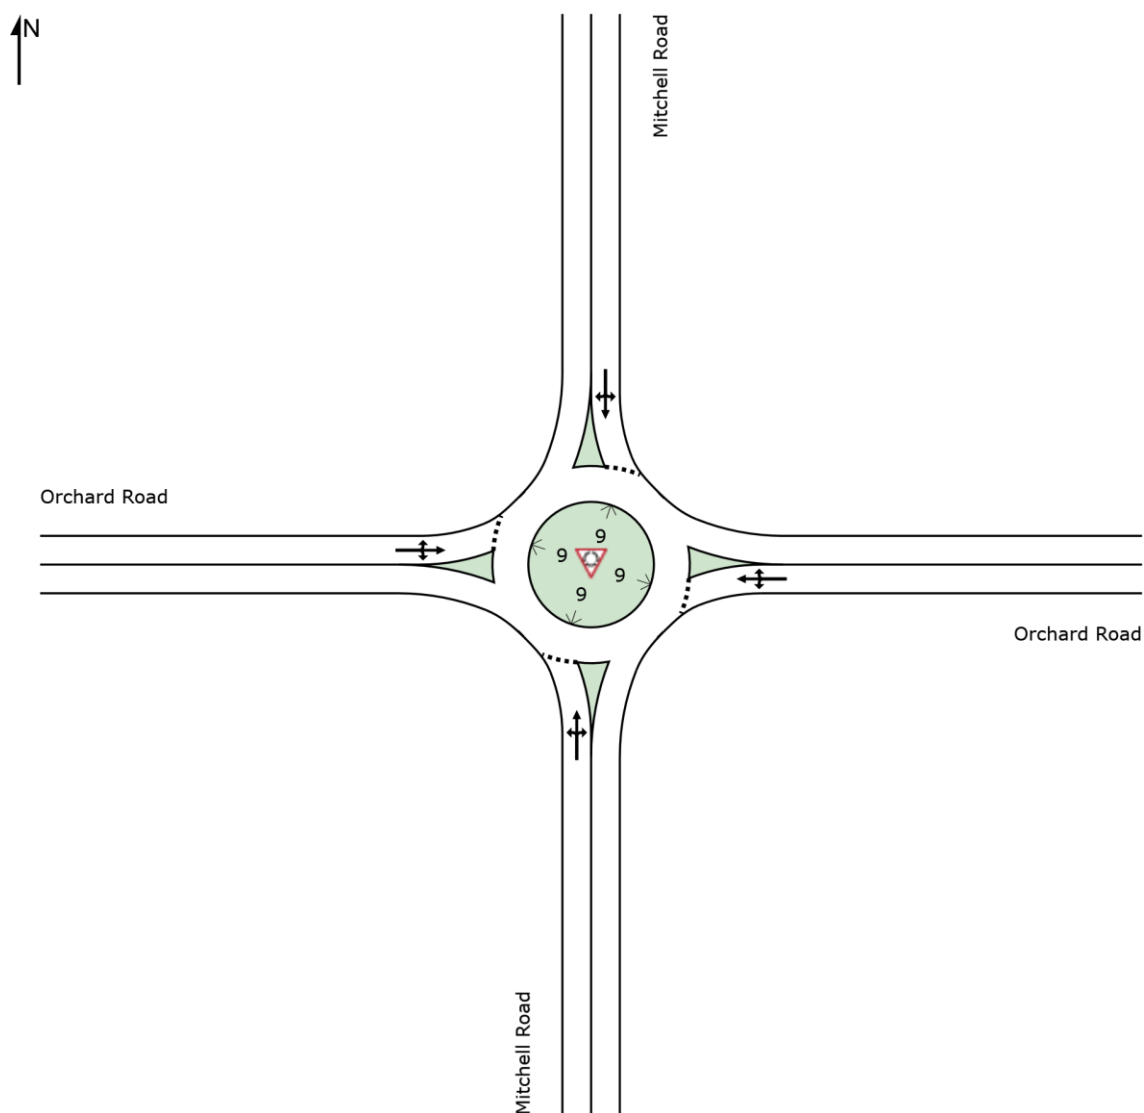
Roundabout Intersection Layout of Mitchell Road with Orchard Road (SIDRA)
